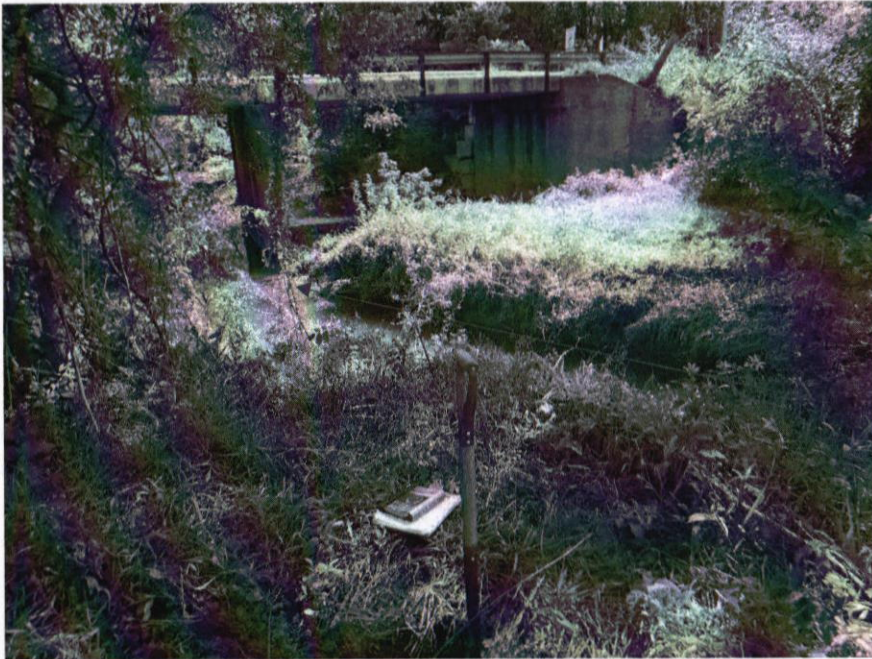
Facing southeast from SP 1, across UNT to Bull Fork (path soon with red arrow).
